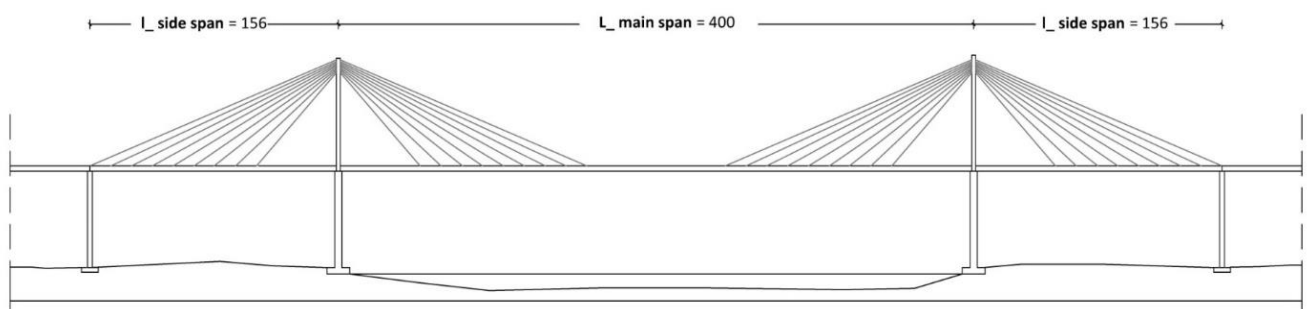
Friedrich-Erbert Bridge (or Bonn Nord Bridge) (1967)\
